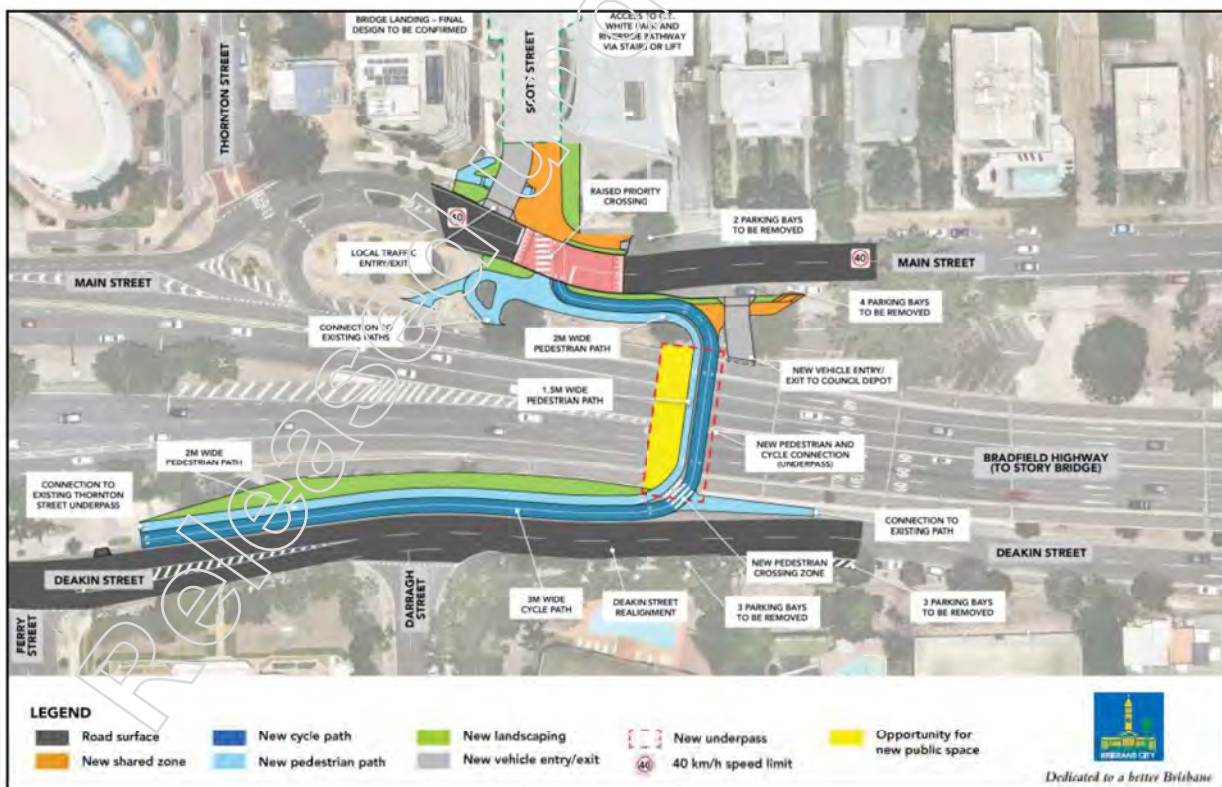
Kangaroo Point Green Bridge Deakin Street connection (BCC)
